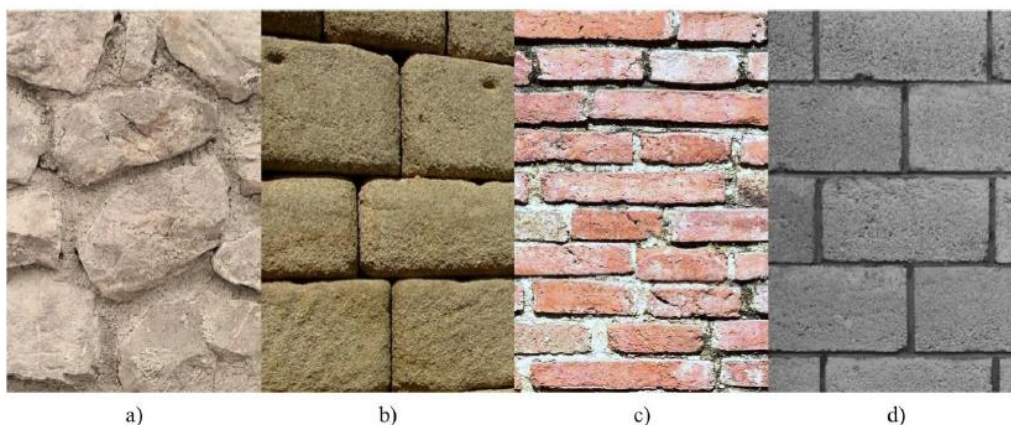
Examples of different masonry typologies: a) Rubble stone masonry, b) ashlar stone masonry with dry joints, c) clay brick masonry, d) concrete block masonry (Segura Domingo, 2020).
